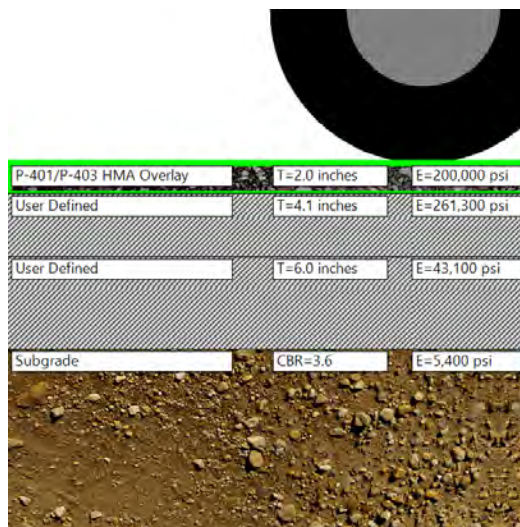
FAARFIELD Pavement Reconstruction Typical Section
